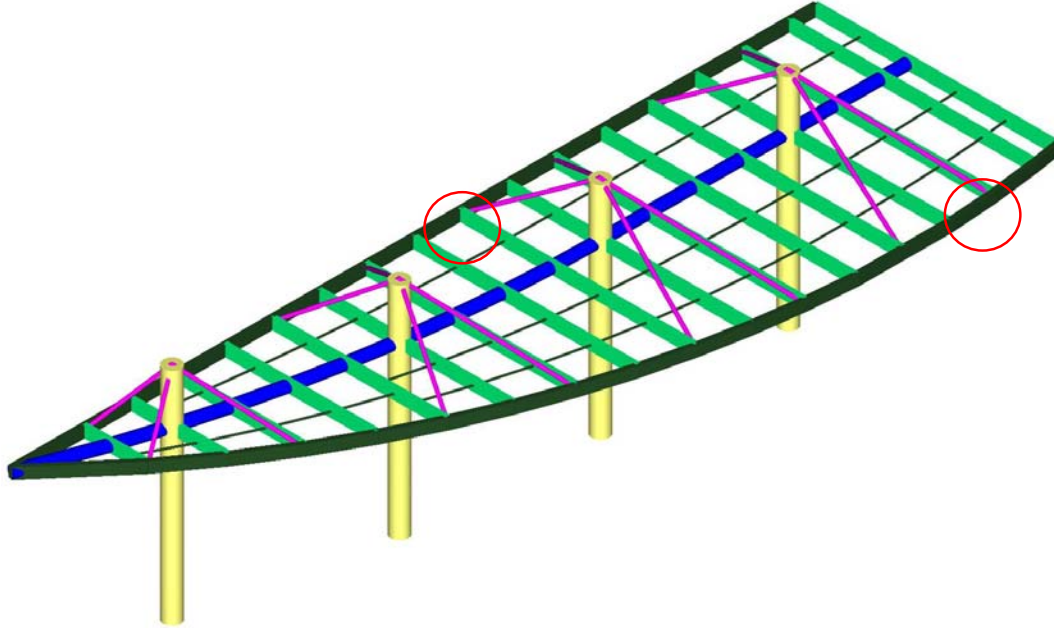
Skewed plate-to-SHS Joints in Real Engineering Project
